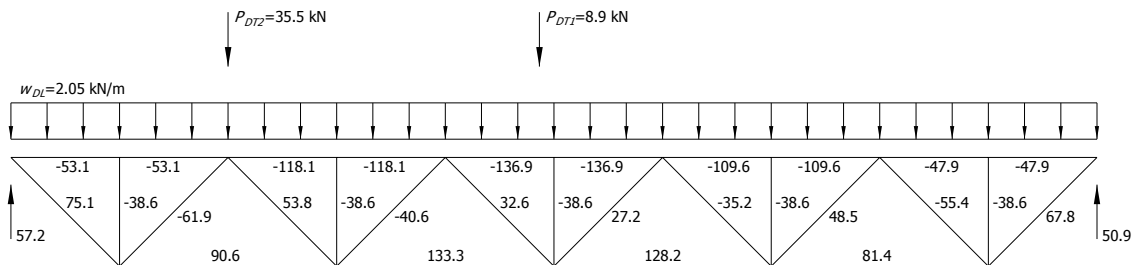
Truss analysis results for 2-truss, 5-module Kenyan Truss bridge
